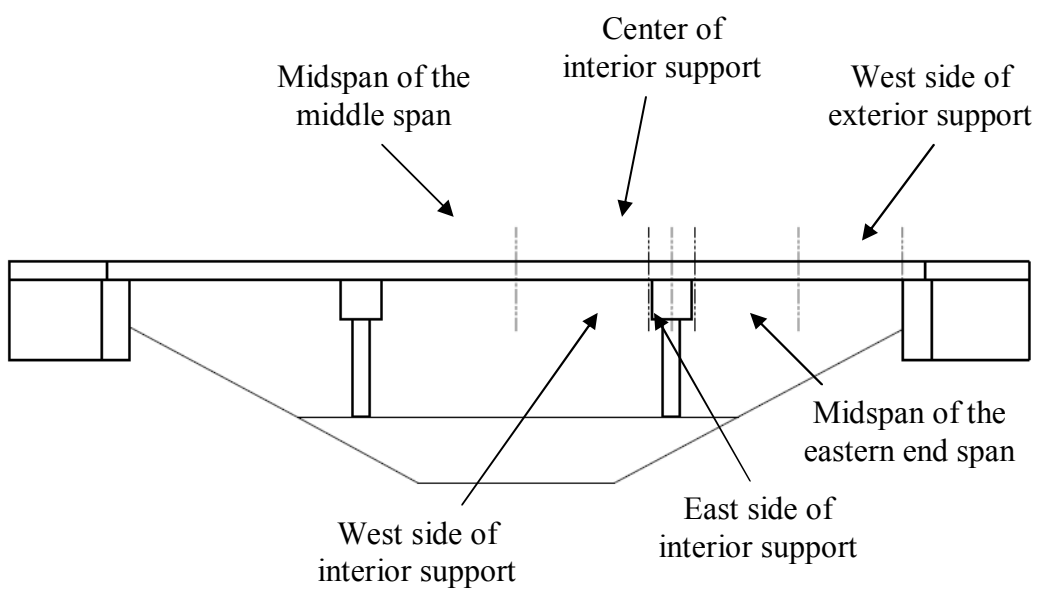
Elevation view of Mn/DOT Bridge No. 13004 showing locations of instrumentation along the length of the bridge for continuous behavior over the piers
